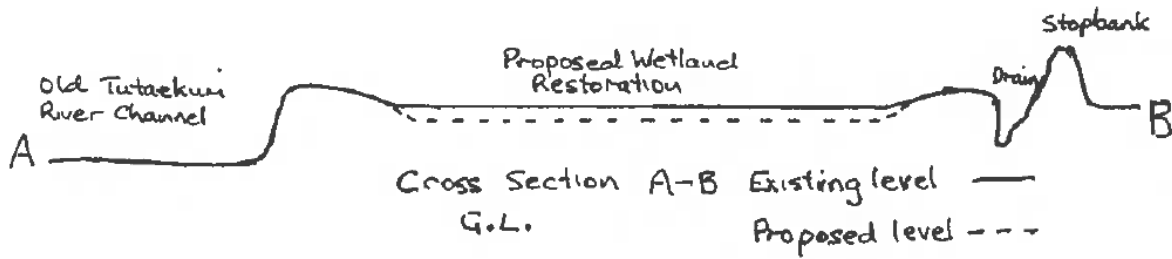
CROSS SECTION OF PROPOSED WETLAND SOUTH OF RAVENSDOWN NAPIER WORKS
